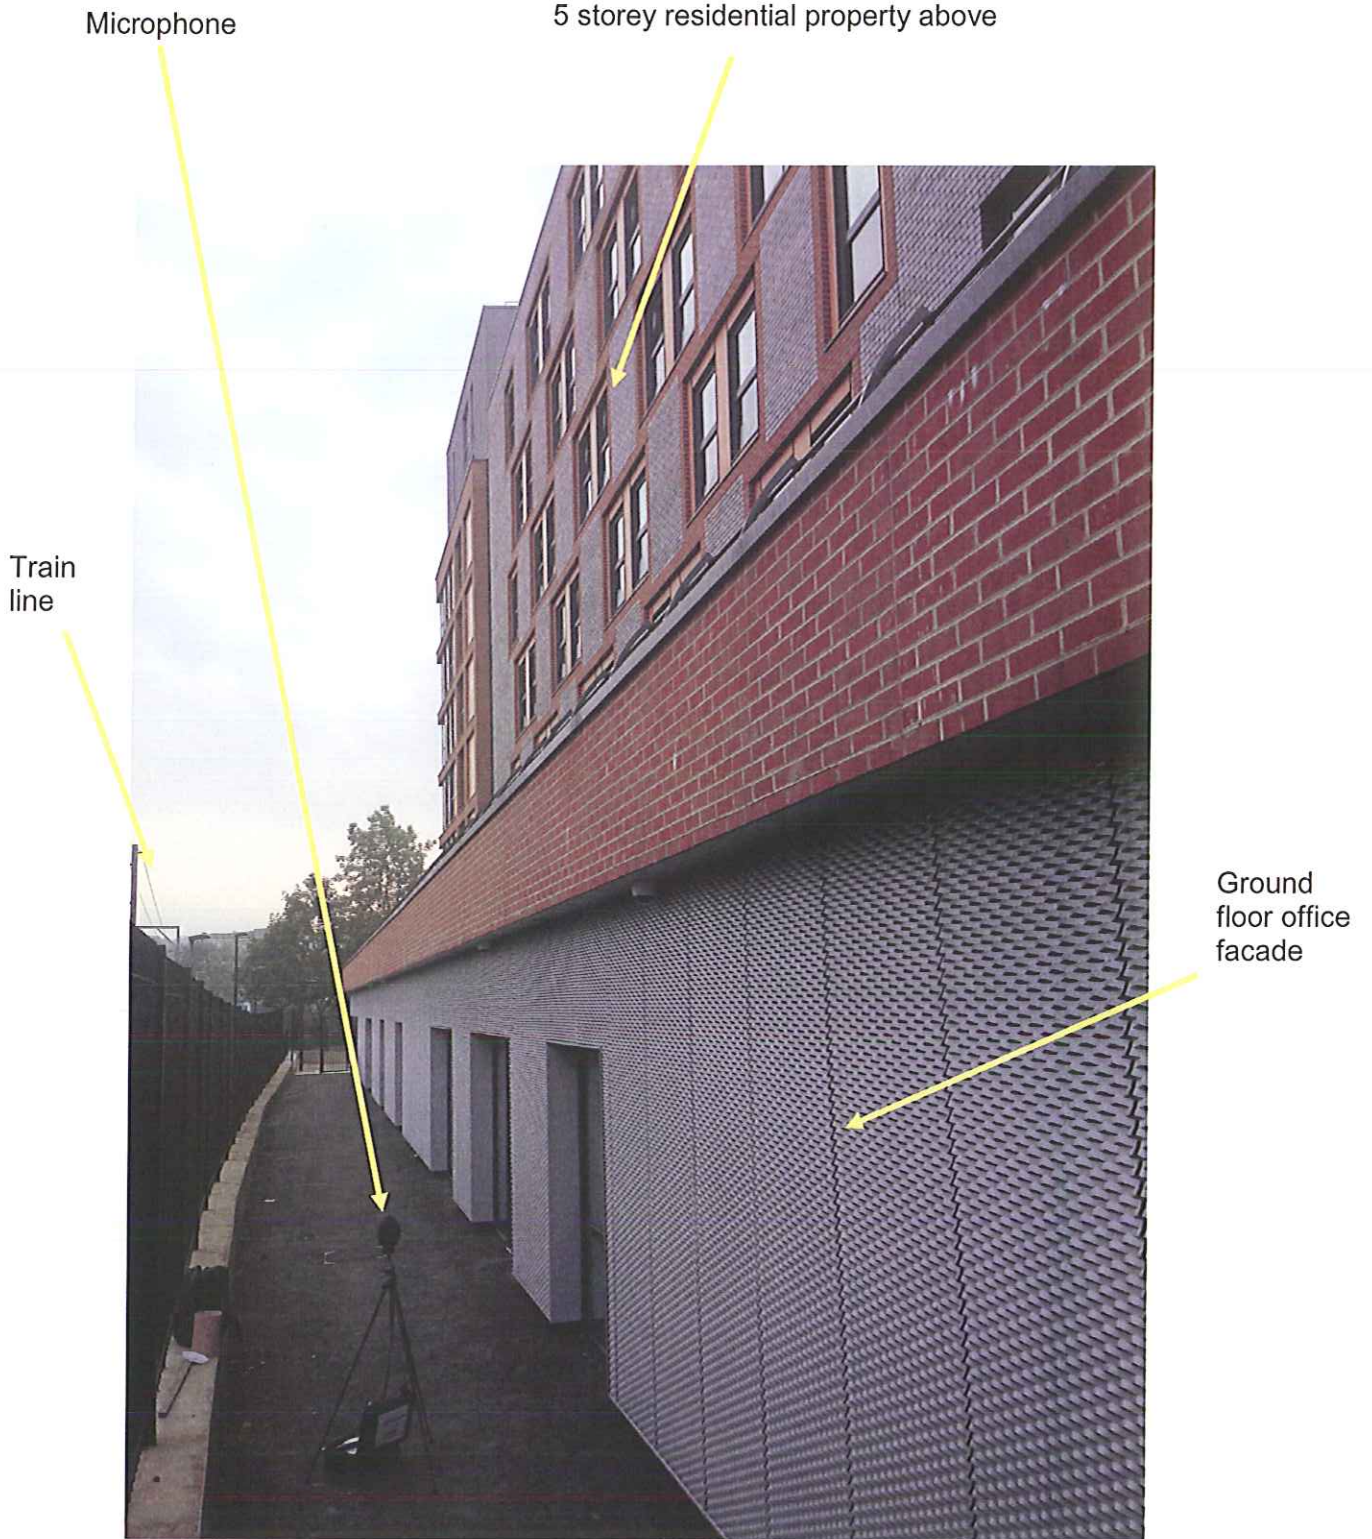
PHOTO A: Location of microphone between ground floor office façade and site boundary railings
